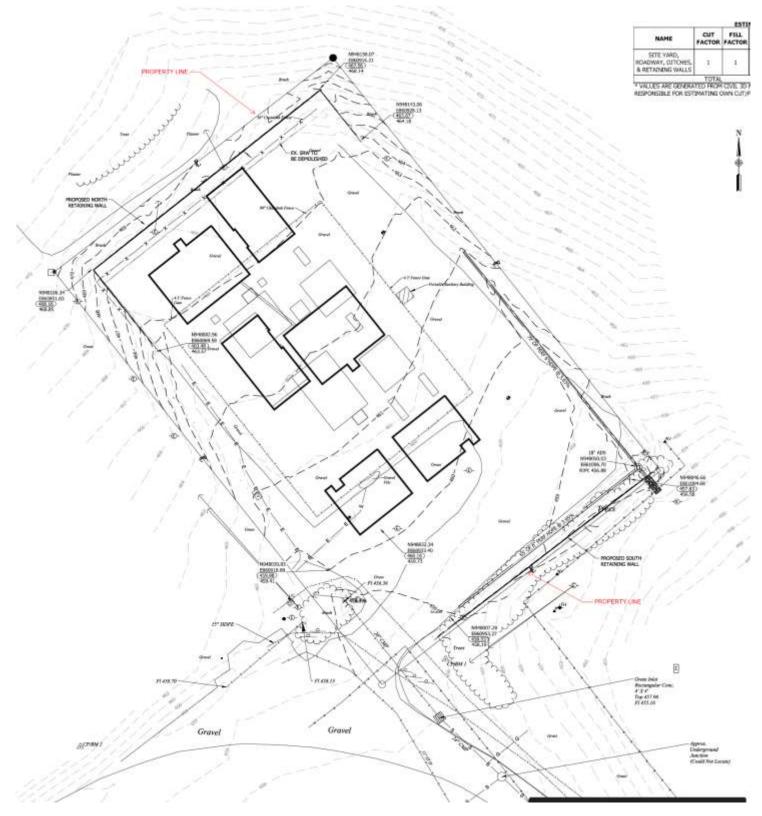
EXHIBIT A: SITE PLAN, SITE GRADING PLAN
